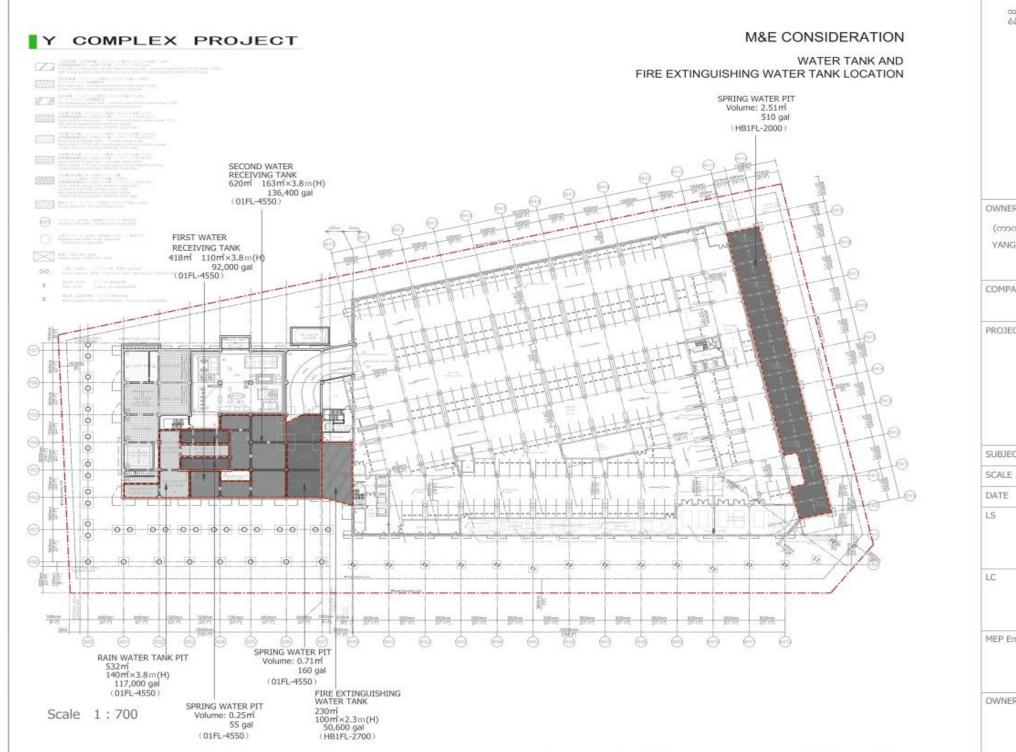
32 Fire Extinguishing Facilities at Y Complex Project
